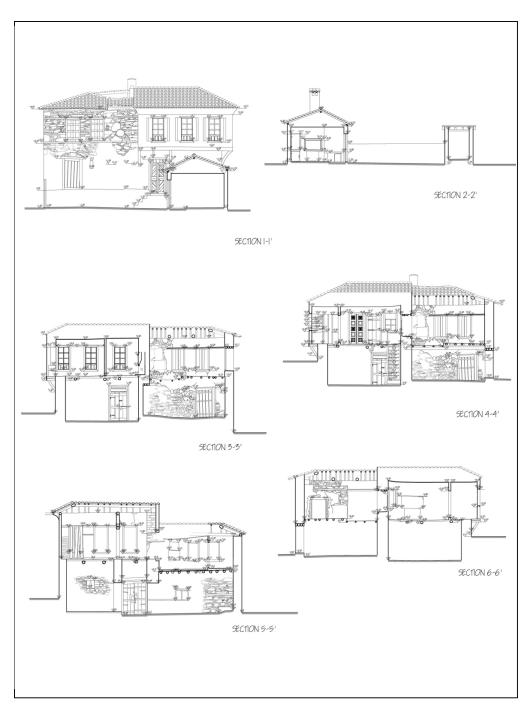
Sections of Yenigün and Çarboğa Houses
